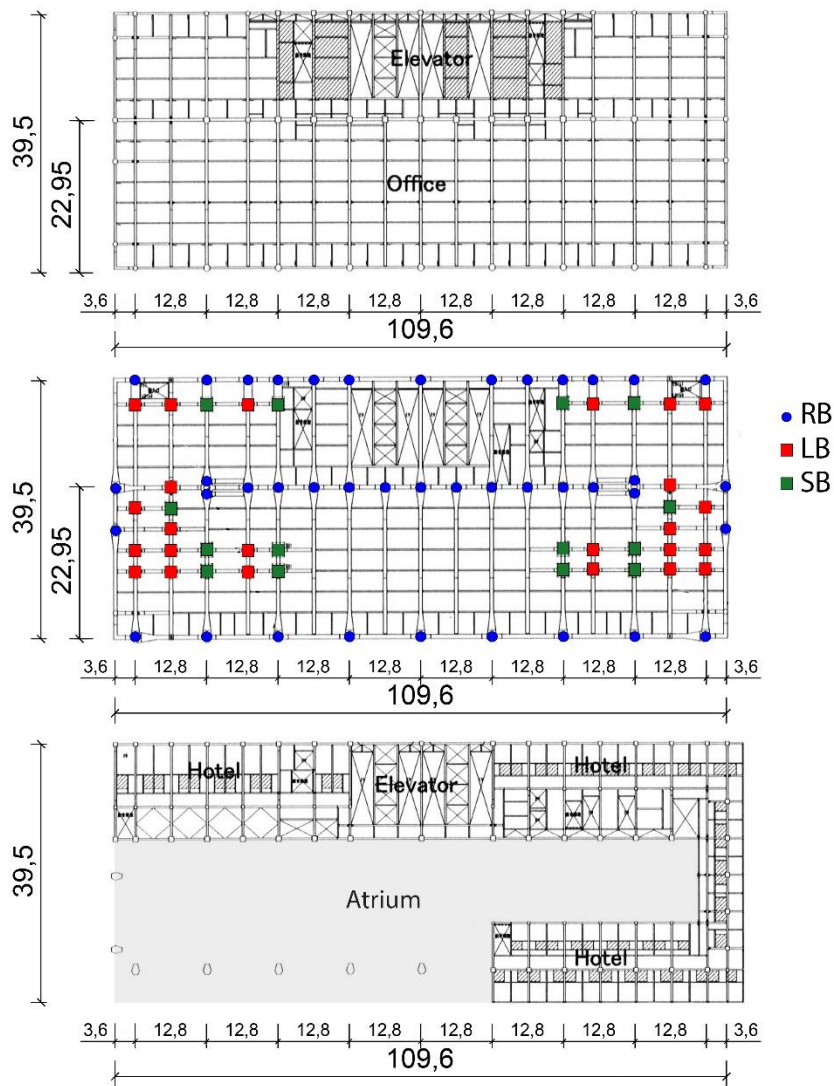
Shiodome Sumitomo building: Plans (a) upper typical floor, (b) isolation floor, (c) lower typical floor, (dimension in meters) [Sueoka et al. 2004]
